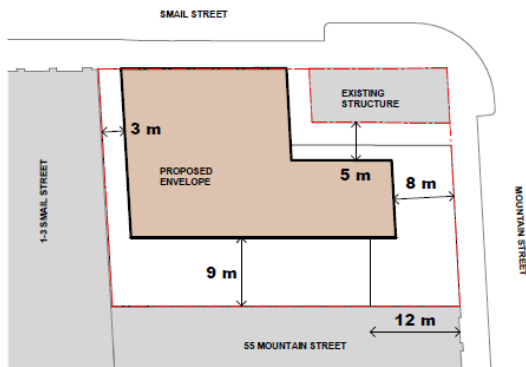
XX 41-49 Mountain Street, Ultimo –envelope setbacks
